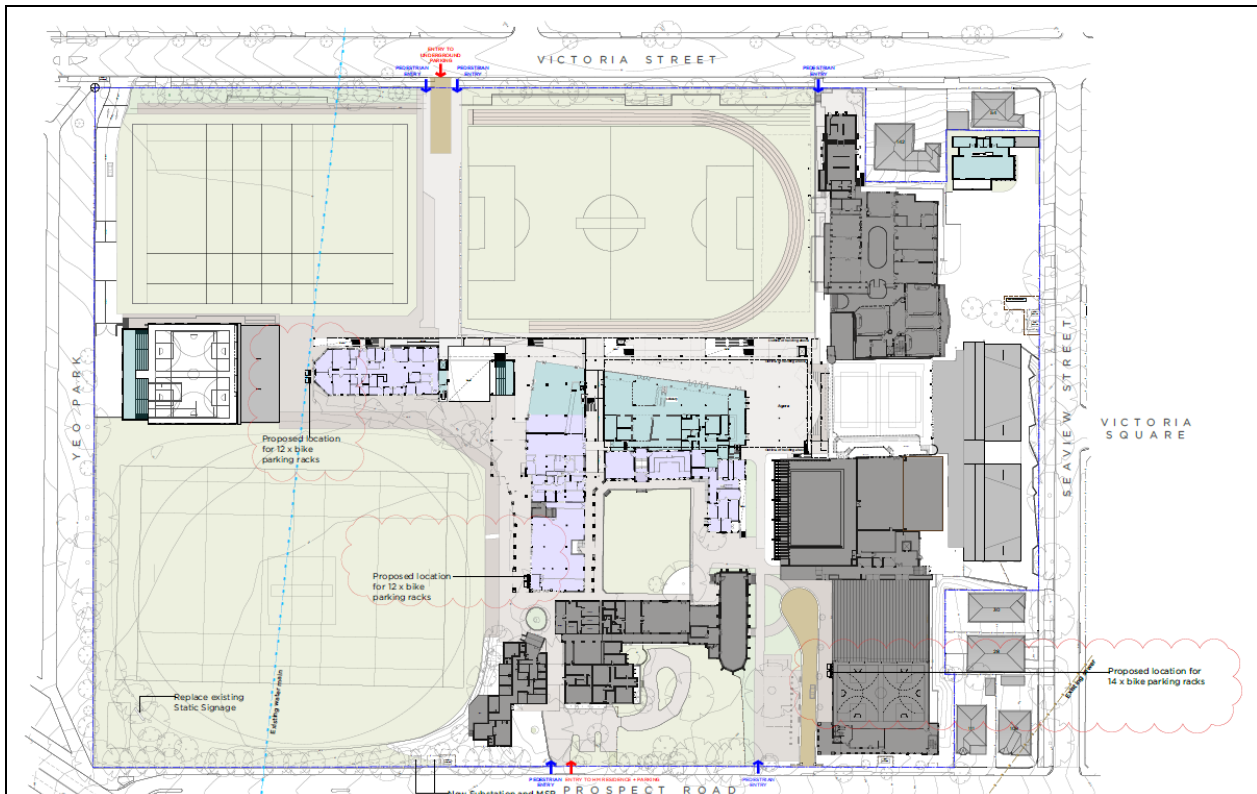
Proposed new bike parking location (Source: PMDL, 2020)
